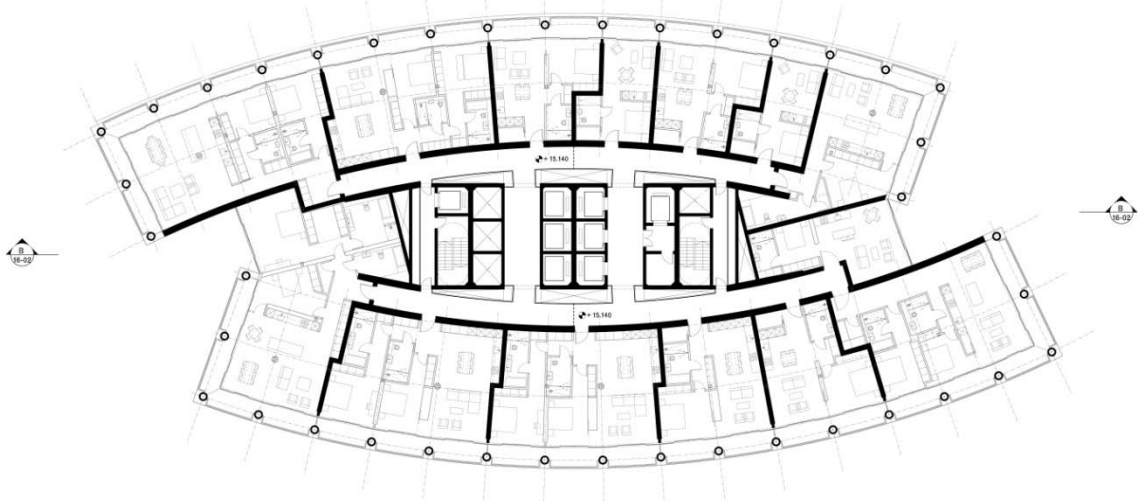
Portland House, Typical Floor Plan 1, Proposal (DCA, 2013)
